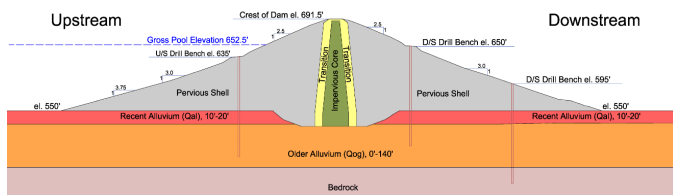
Typical Embankment Cross Section and Exploration Bench Locations.
